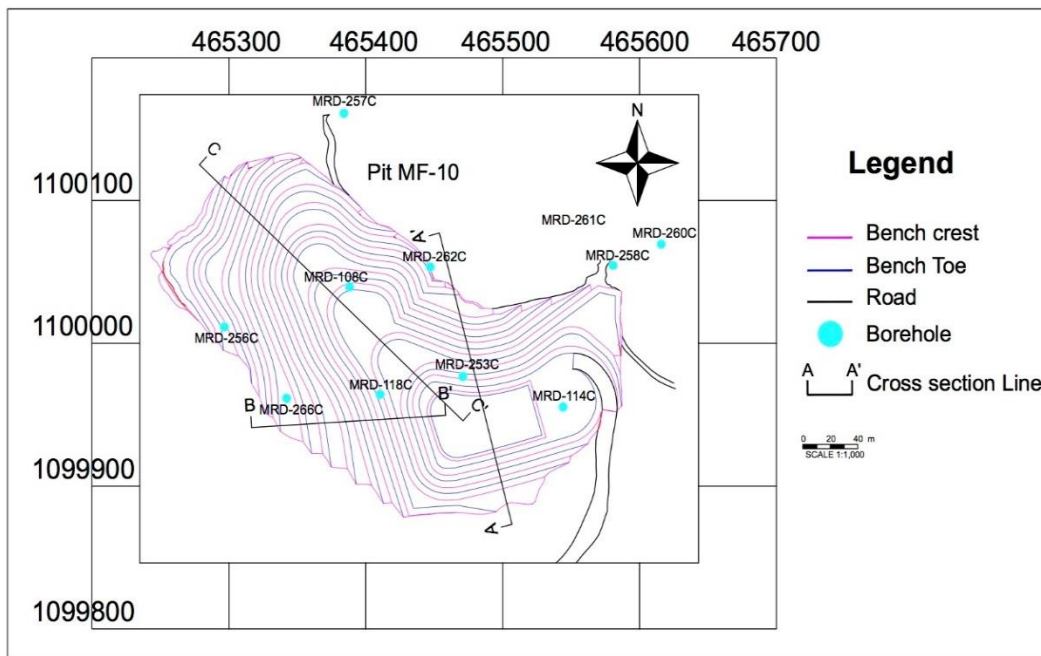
23 Pit MF-10 after mining by Pit design Ver.1 and its cross-section line
